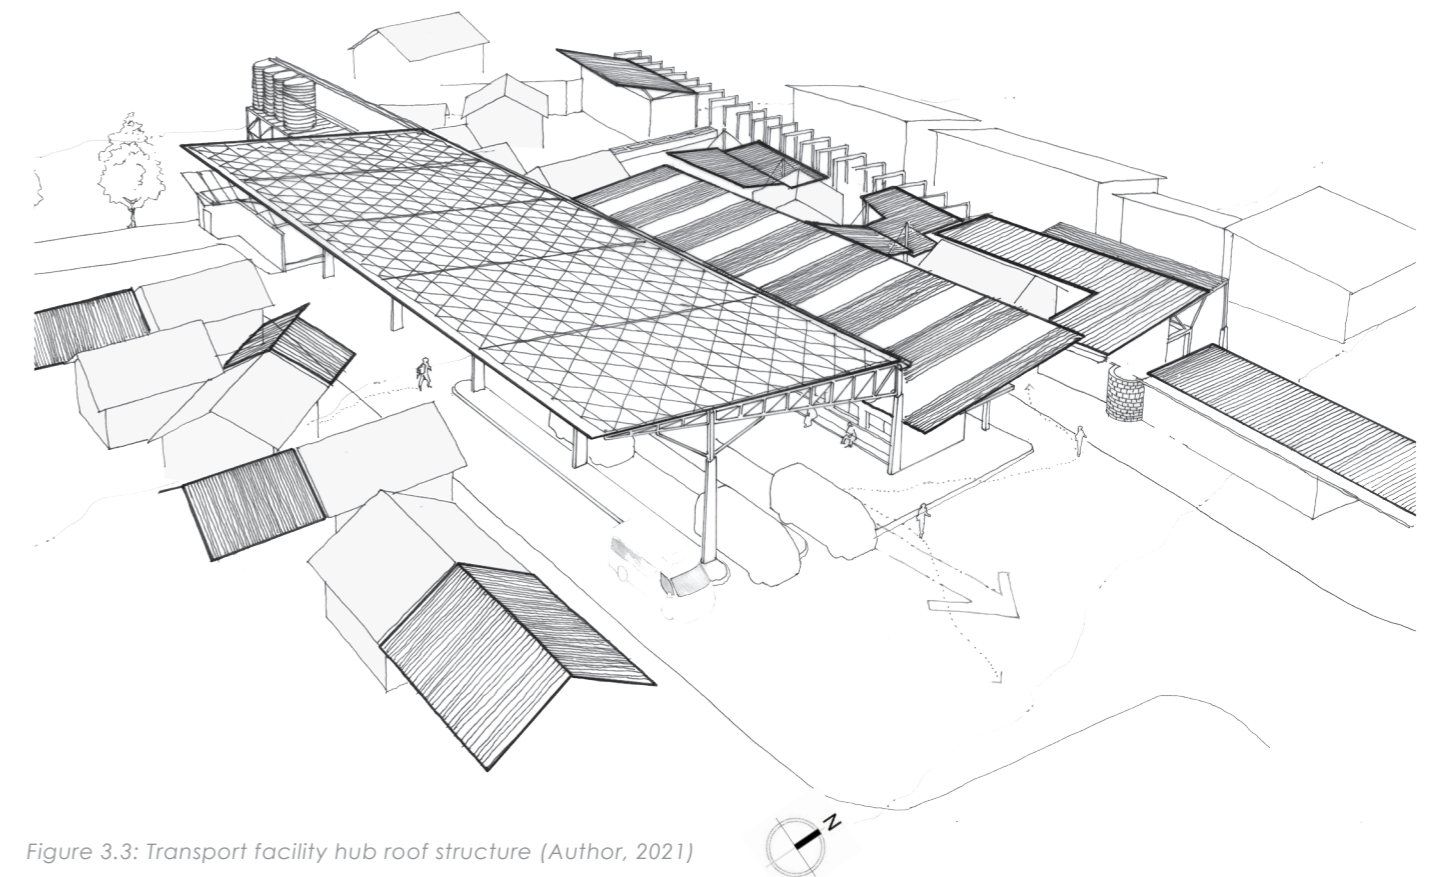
Transport facility hub roof structure (Author, 2021)
